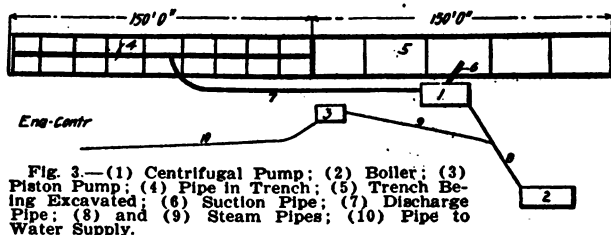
Arrangement of Plant for Excavation in Quicksand.
